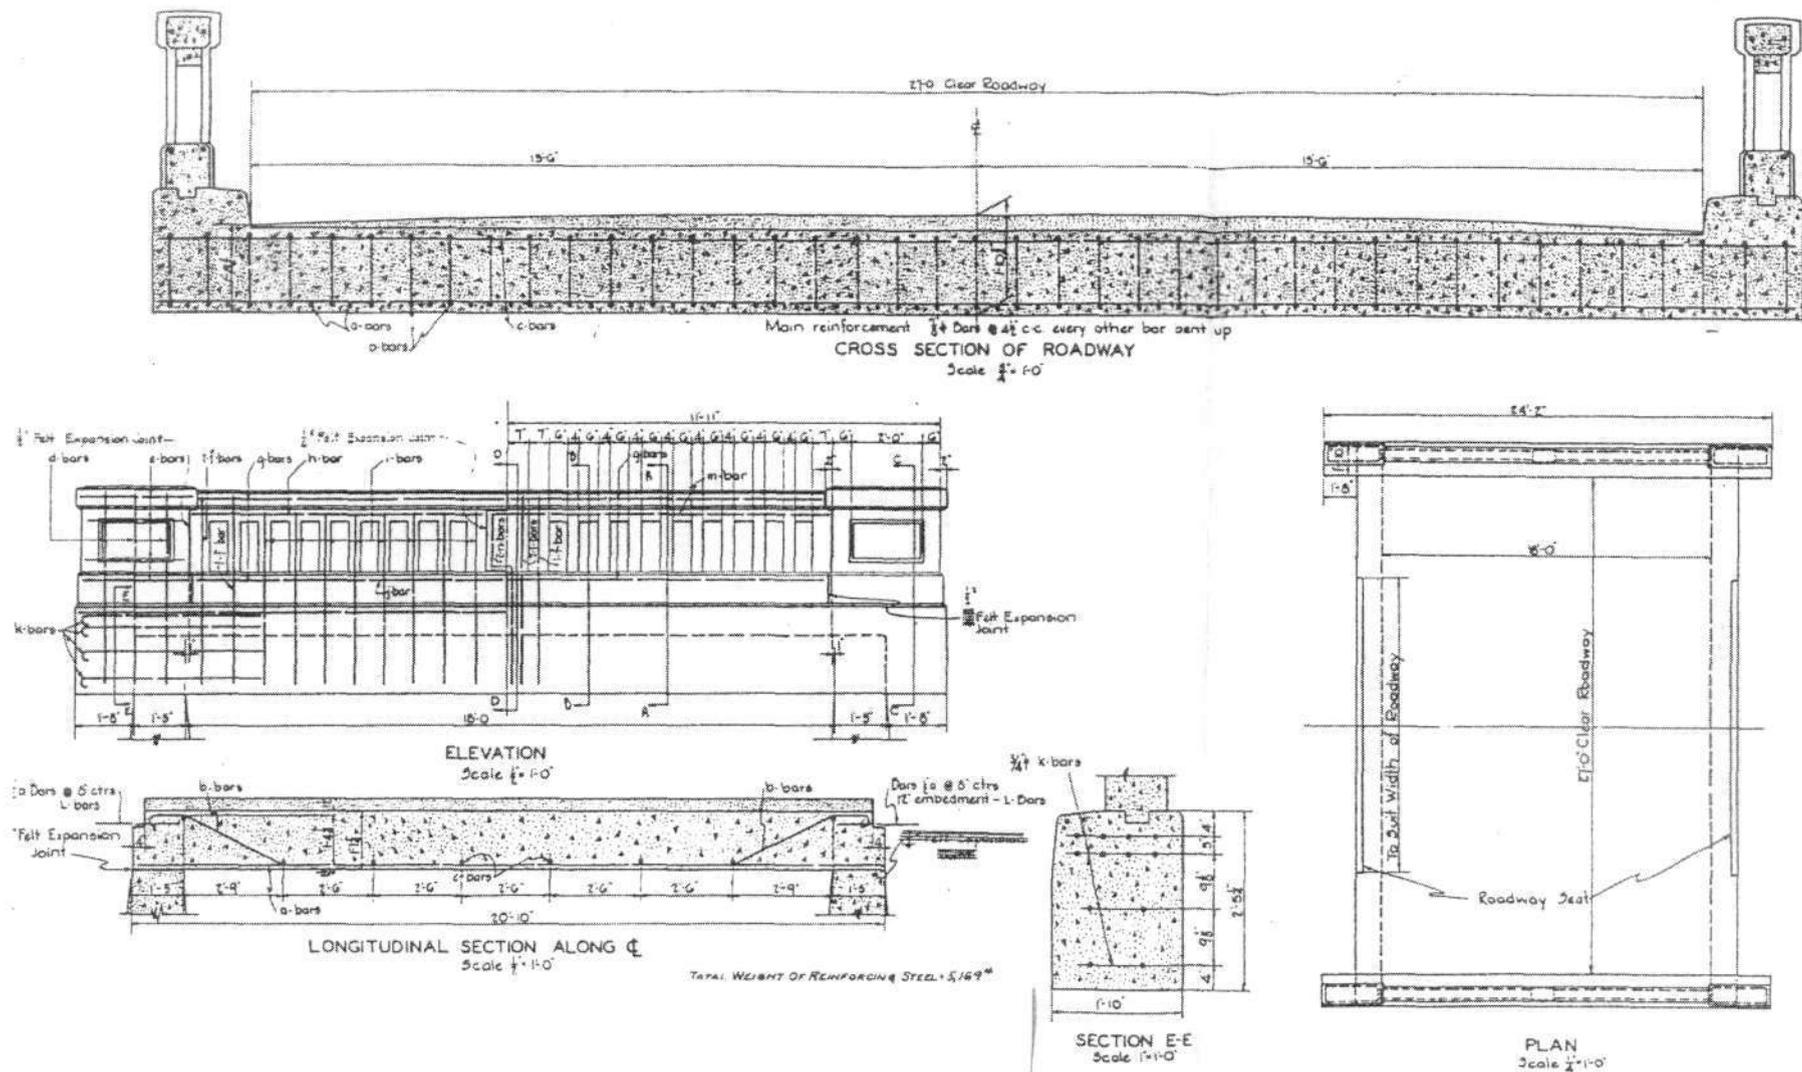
These drawings are some of the specifications for a concrete slab bridge from the 1930 Standard Plan issued by the Maryland Roads Commission. With the addition of a central supporting pier, these specifications are virtually identical to those for the 40-foot-long Price Station Road Bridge.
